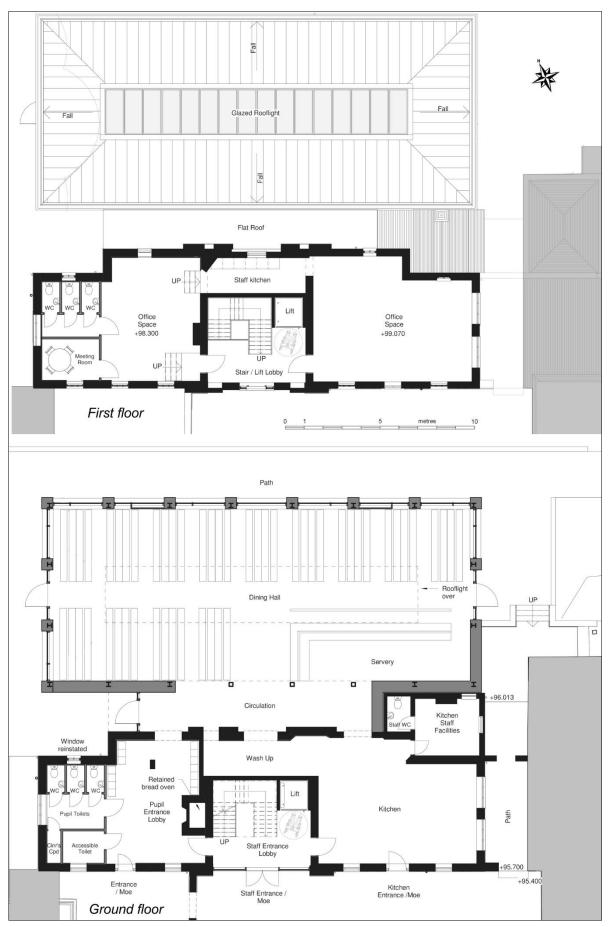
Stable Block: proposed ground- and first-floor plans (scale 1:200)
